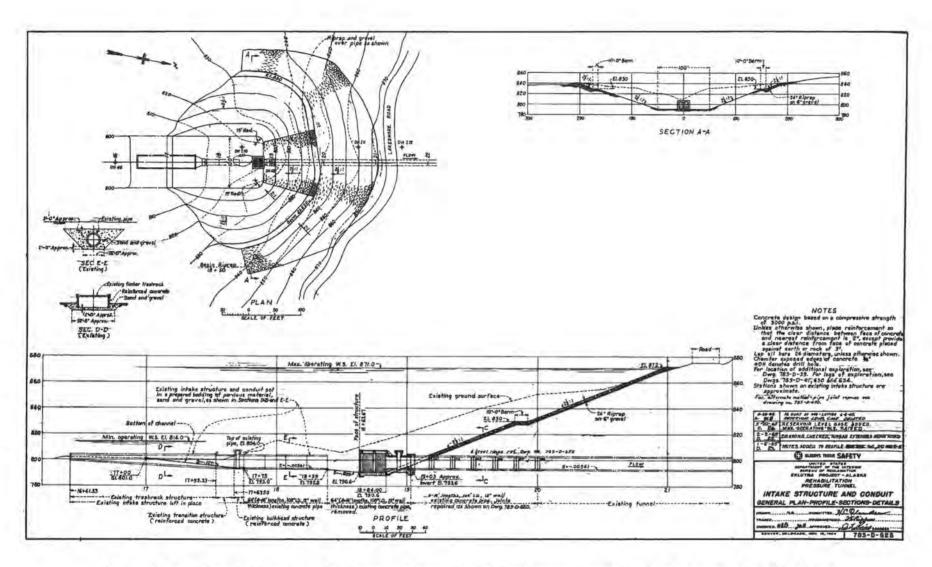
Plan and elevation of new intake structure and rehabilitated conduit. From drawing No. 783-D-623, revised June 30, 1965.
